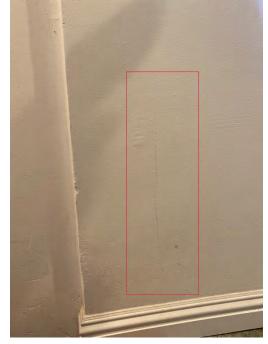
PHOTOS SHOW THE CRACKS AND SEPARATION FAILURES TO THE SHEETROCK IN BOTH THE WALLS AND CEILINGS DUE TO THE SETTLING FOUNDATION. THIS IS AN ONGOING DEFECT THAT IS WORSENING OVER TIME AS THE FOUNDATION IS NOT STABLE AND IN MOTION.
